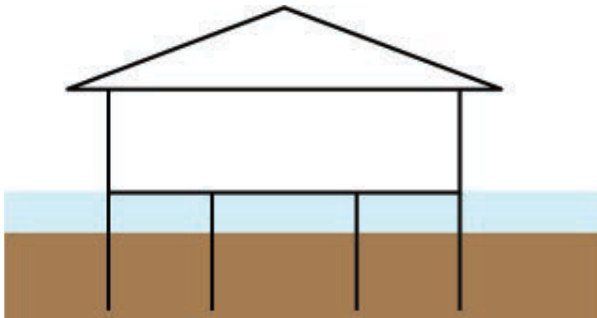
Pier New Construction* (NYC Department of Planning 2013a)
